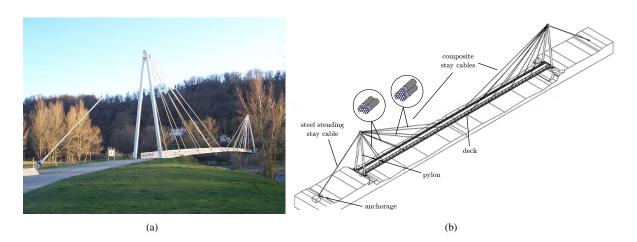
Laroin footbridge: Picture (a) and structure (b).
